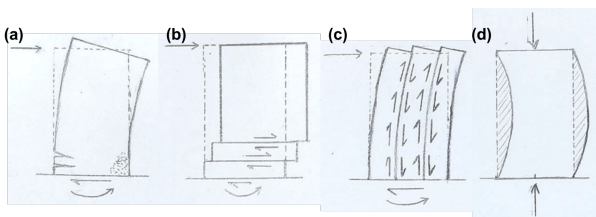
Failure mechanism of shear wall (a) flexural failure, (b) horizontal shear, (c) vertical shear, (d) buckling
